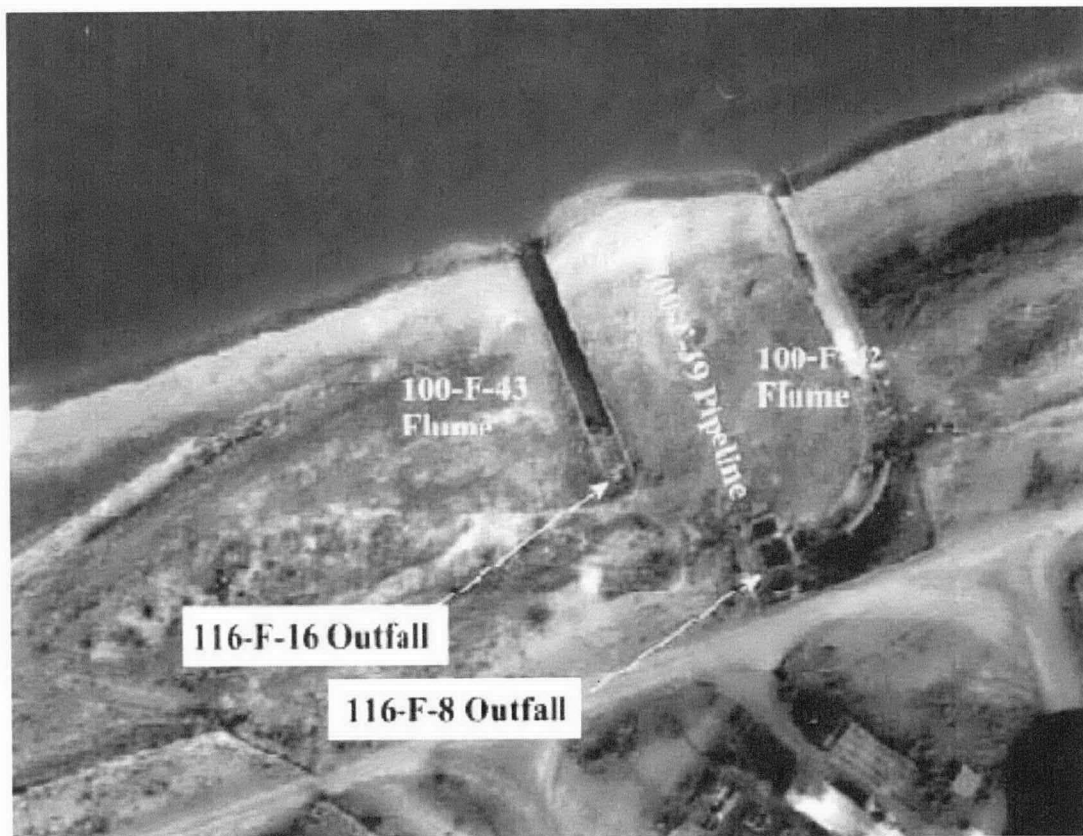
Aerial View of 100-F Outfall Structures (circa 1956)
